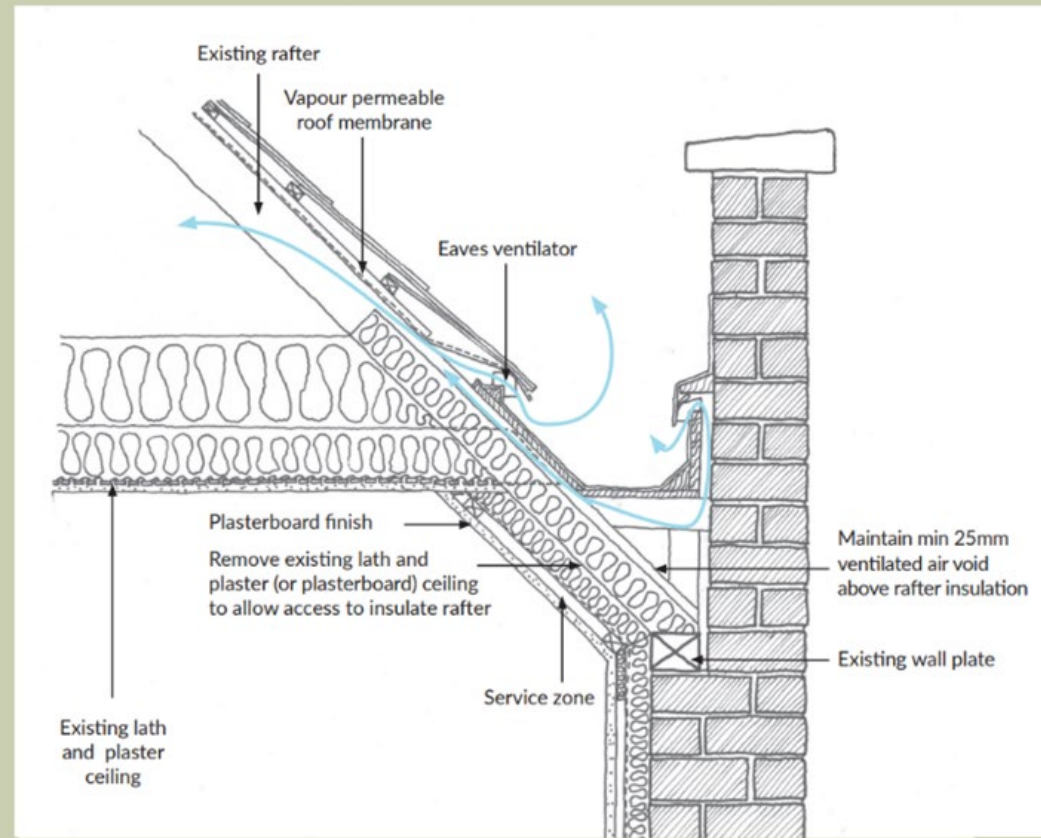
A hybrid system combining horizontal insulation at ceiling level and pitched insulation at rafter level to the sloped section of ceiling can also be used
